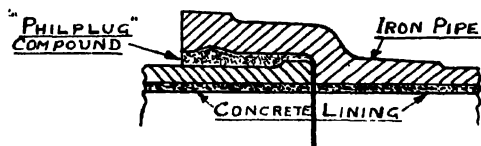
CONCRETE-LINED IRON PIPE JOINT
